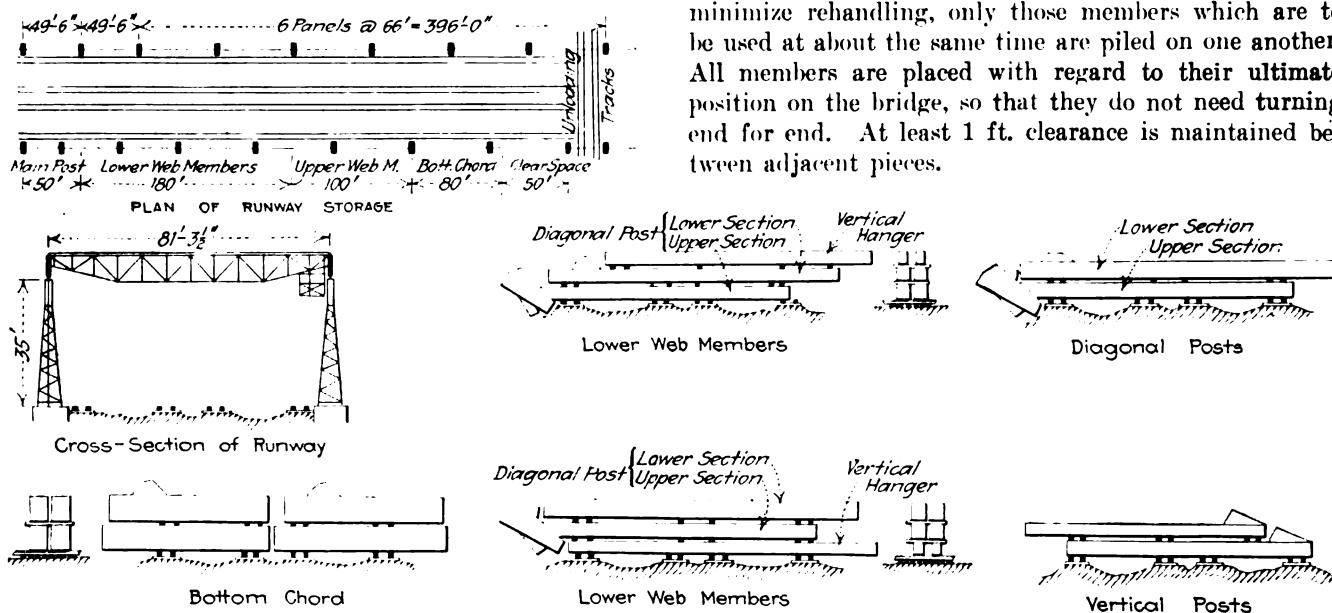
STORAGE YARD AND TYPICAL PILING, NORTH SIDE, QUEBEC BRIDGE
